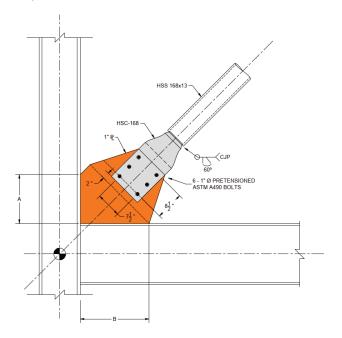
2tp requirements should be maintained when increasing dimensions "A" and "B"
